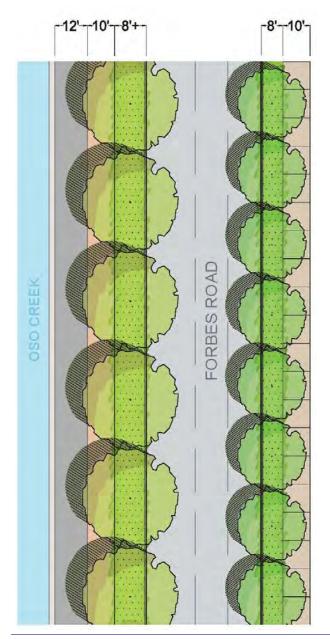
A Forbes Road, South of Crown Valley Parkway: Typical Plan View, Character, and Plant Palette
